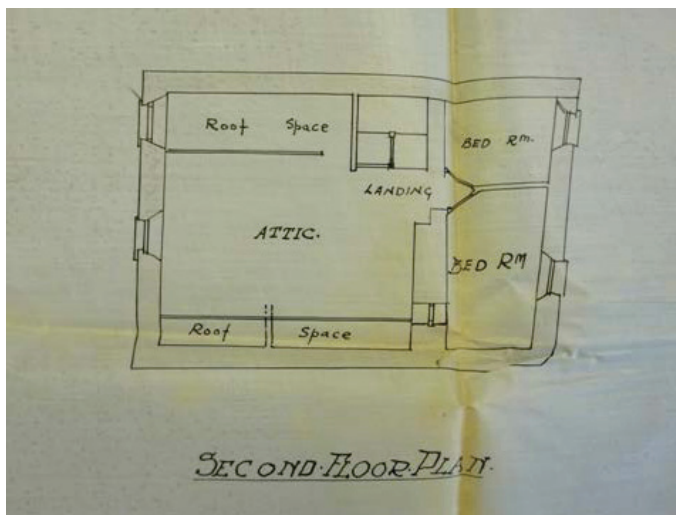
(left): Proposed second floor plan (CAC(B) BSRDNL/3/252 1923)
